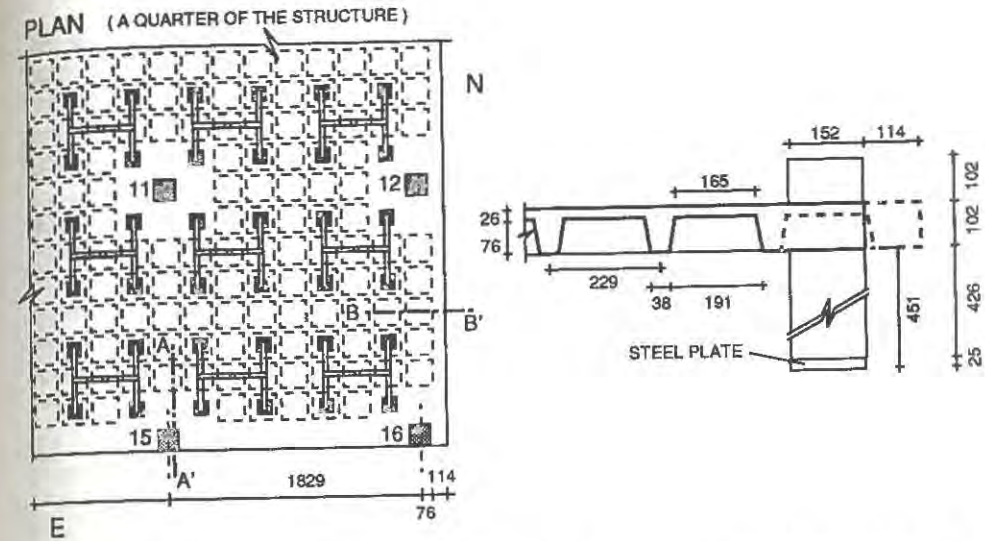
Dimensions of the waffle flat slab and loading system details (left) and detail of the waffle flat slab (right)
